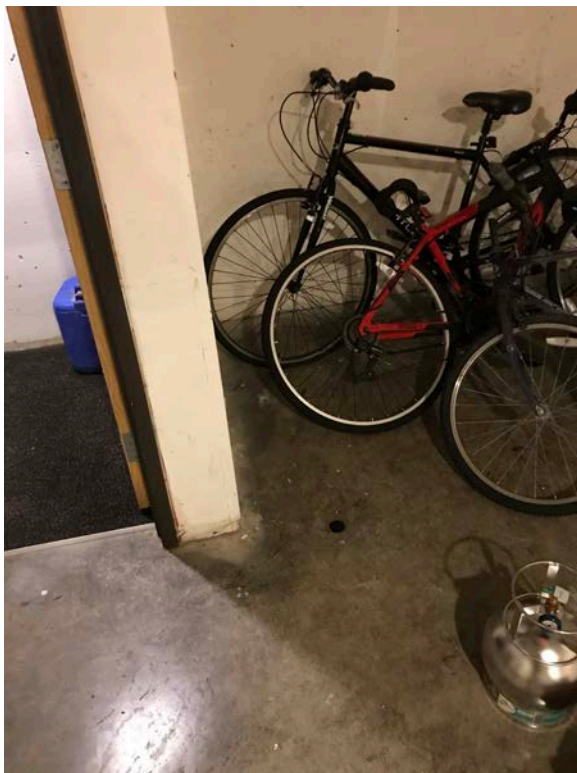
Looking southeast in basement at sub-slab sample location VP-2.
